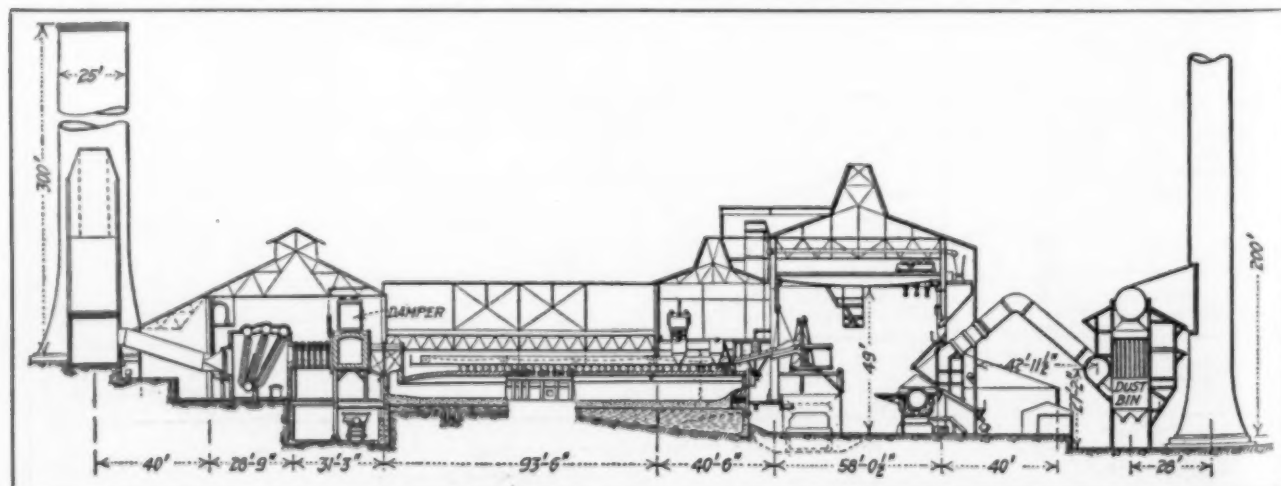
TYPICAL CROSS-SECTION OF THE INTERNATIONAL SMELTING CO.'S PLANT.
